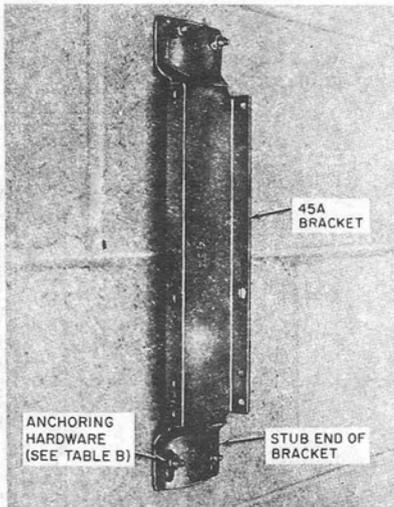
45A Mounting Bracket Mounted Vertically on Wall
